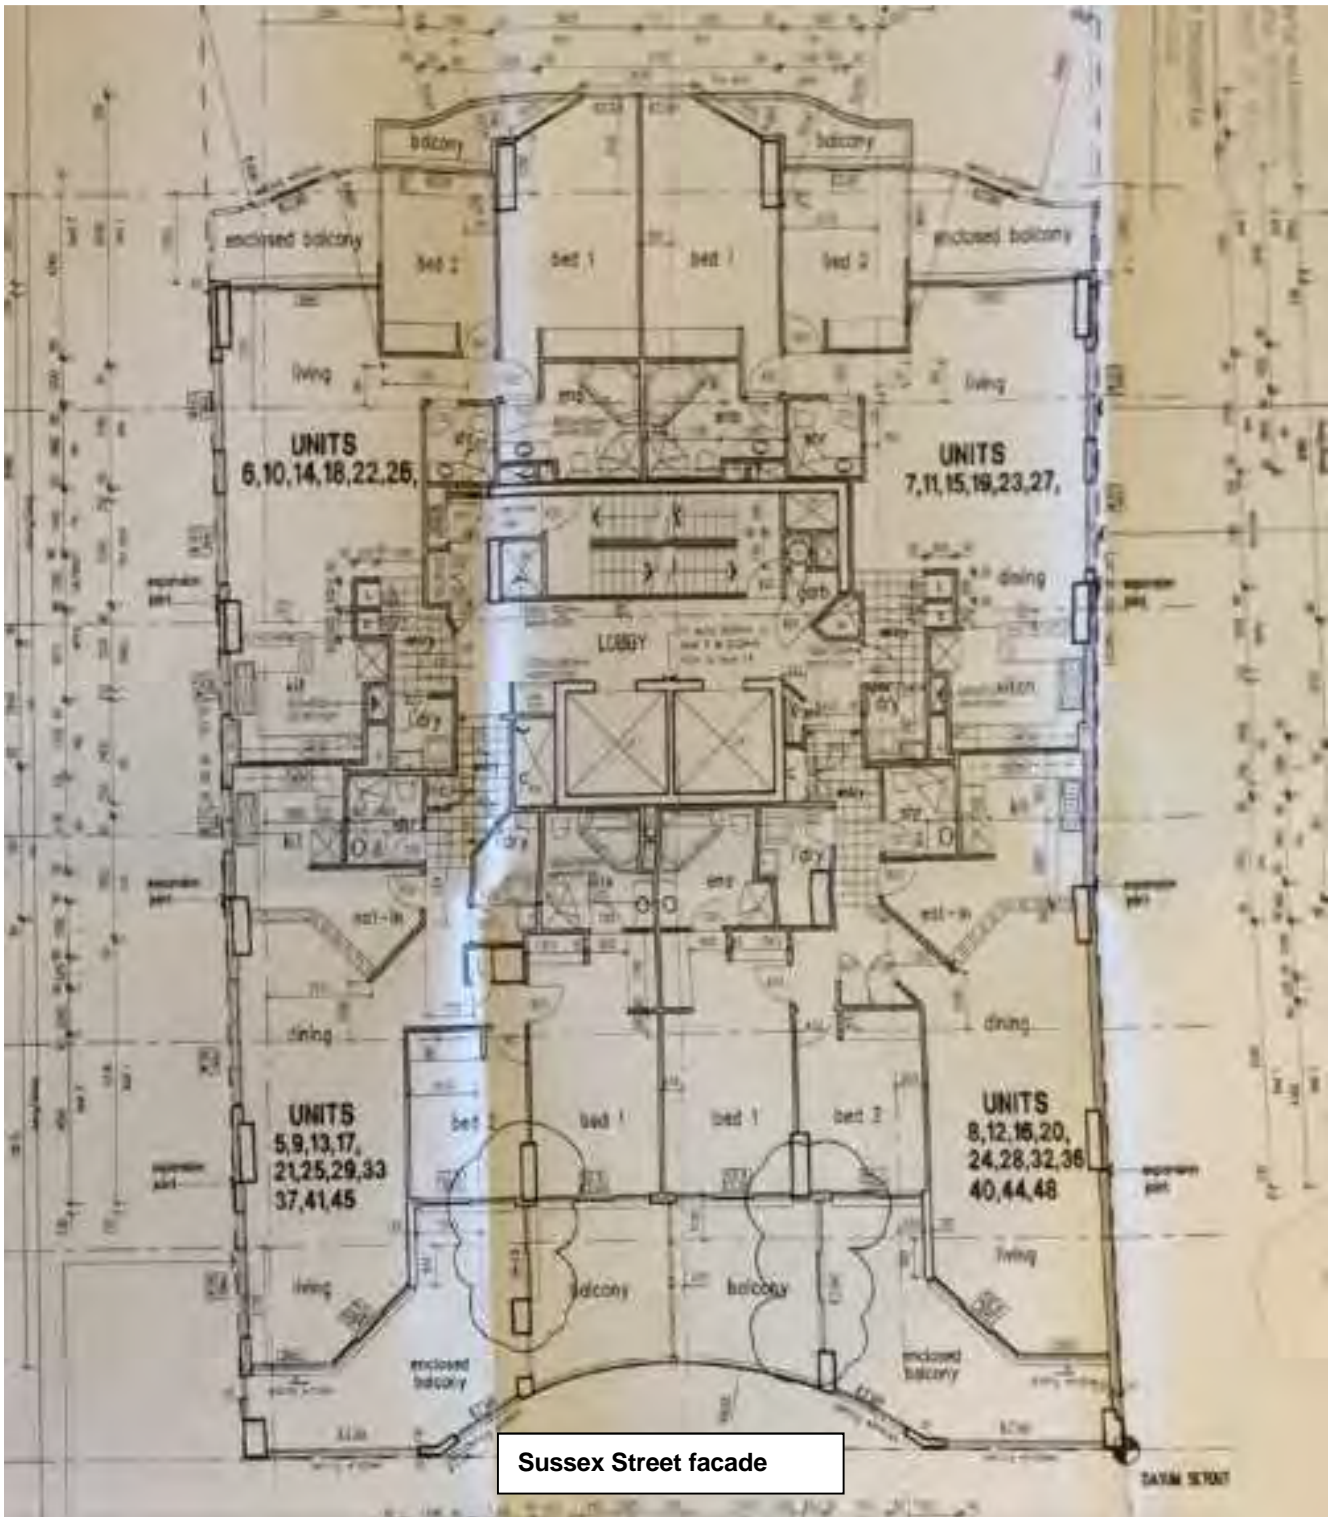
Level 3 – Level 14 Floor Plan (Astoria)
